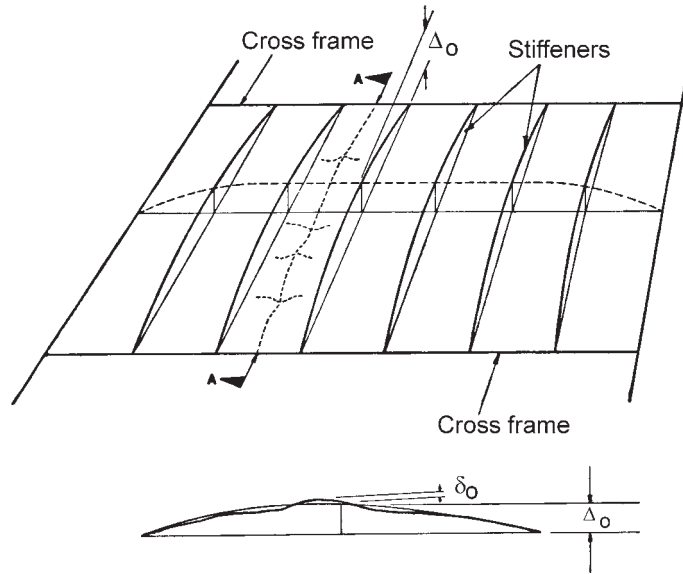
Stiffener and plate ripple component of out-of-plane imperfections
